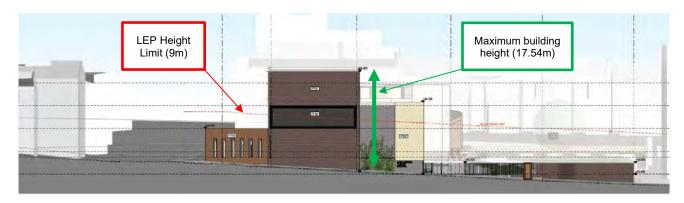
Southern Elevation of Proposed Development Showing Maximum Building Height and Height Limit
